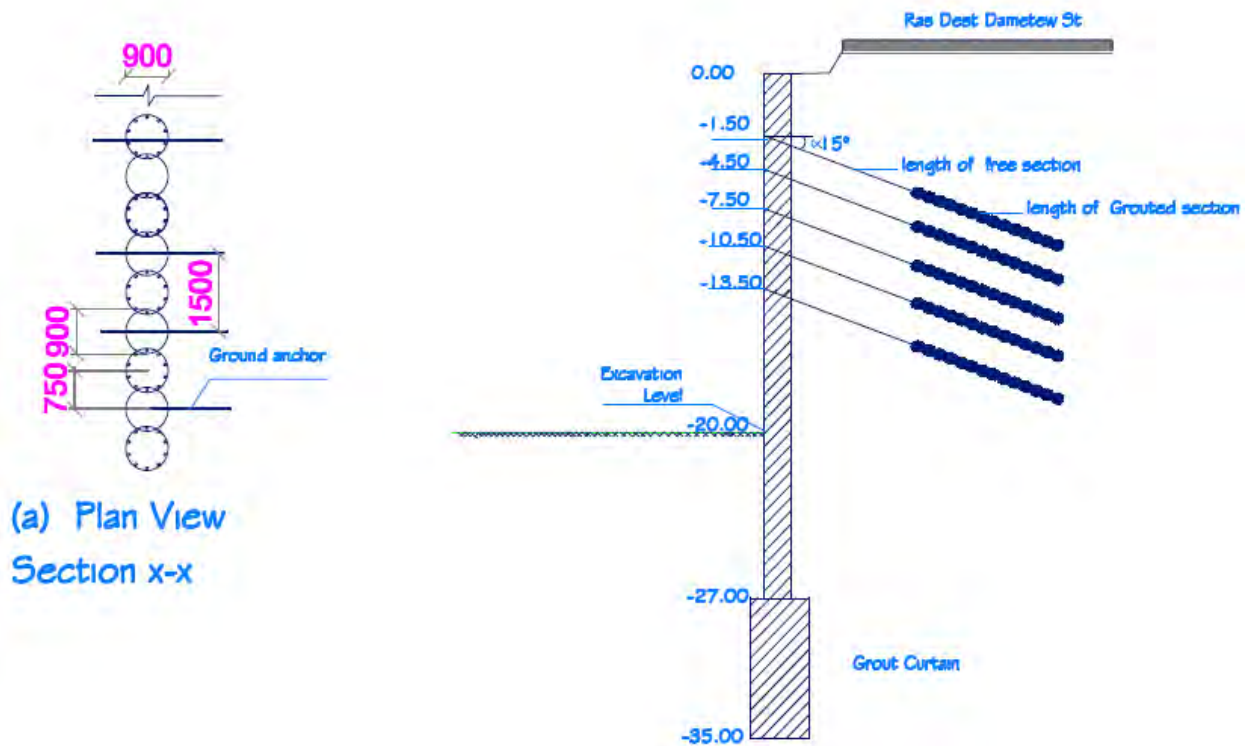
Cross section of the secant pile wall as the alternative scheme
